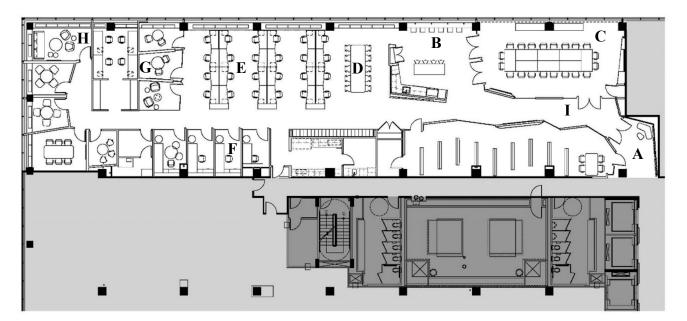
ASID Floor Plan (American Society of Interior Designers, 2017)
